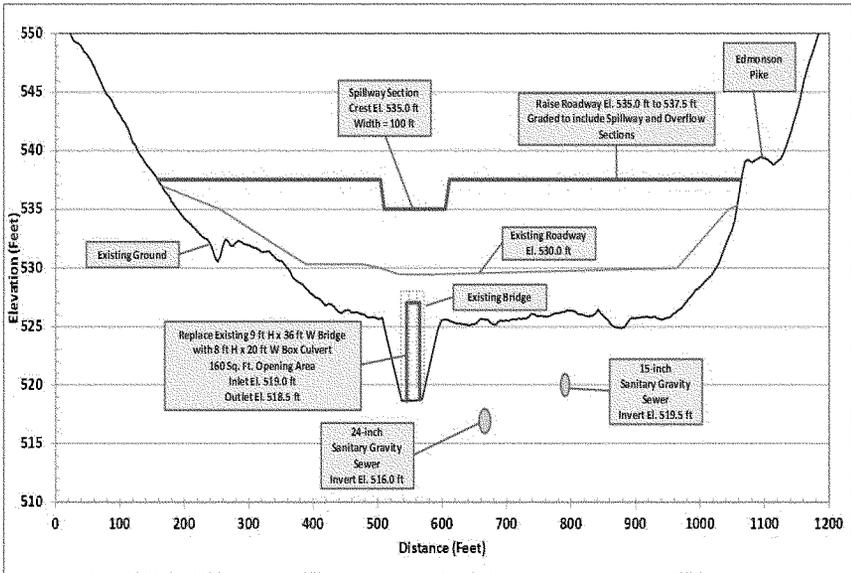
Proposed Design Plans for Sevenmile Creek Bridge Replacement.
